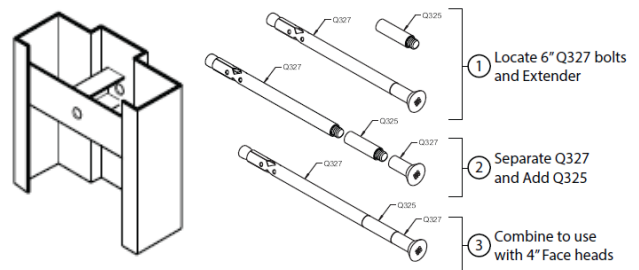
WELD-IN TUBE AND STRAP (TSTRAP) ANCHORS IN DIMPLED FRAME TO ACCEPT TAPERED FLAT HEAD SLEEVE ANCHORS, INCLUDING ASSEMBLY FOR 4" FACE HEAD APPLICATIONS
